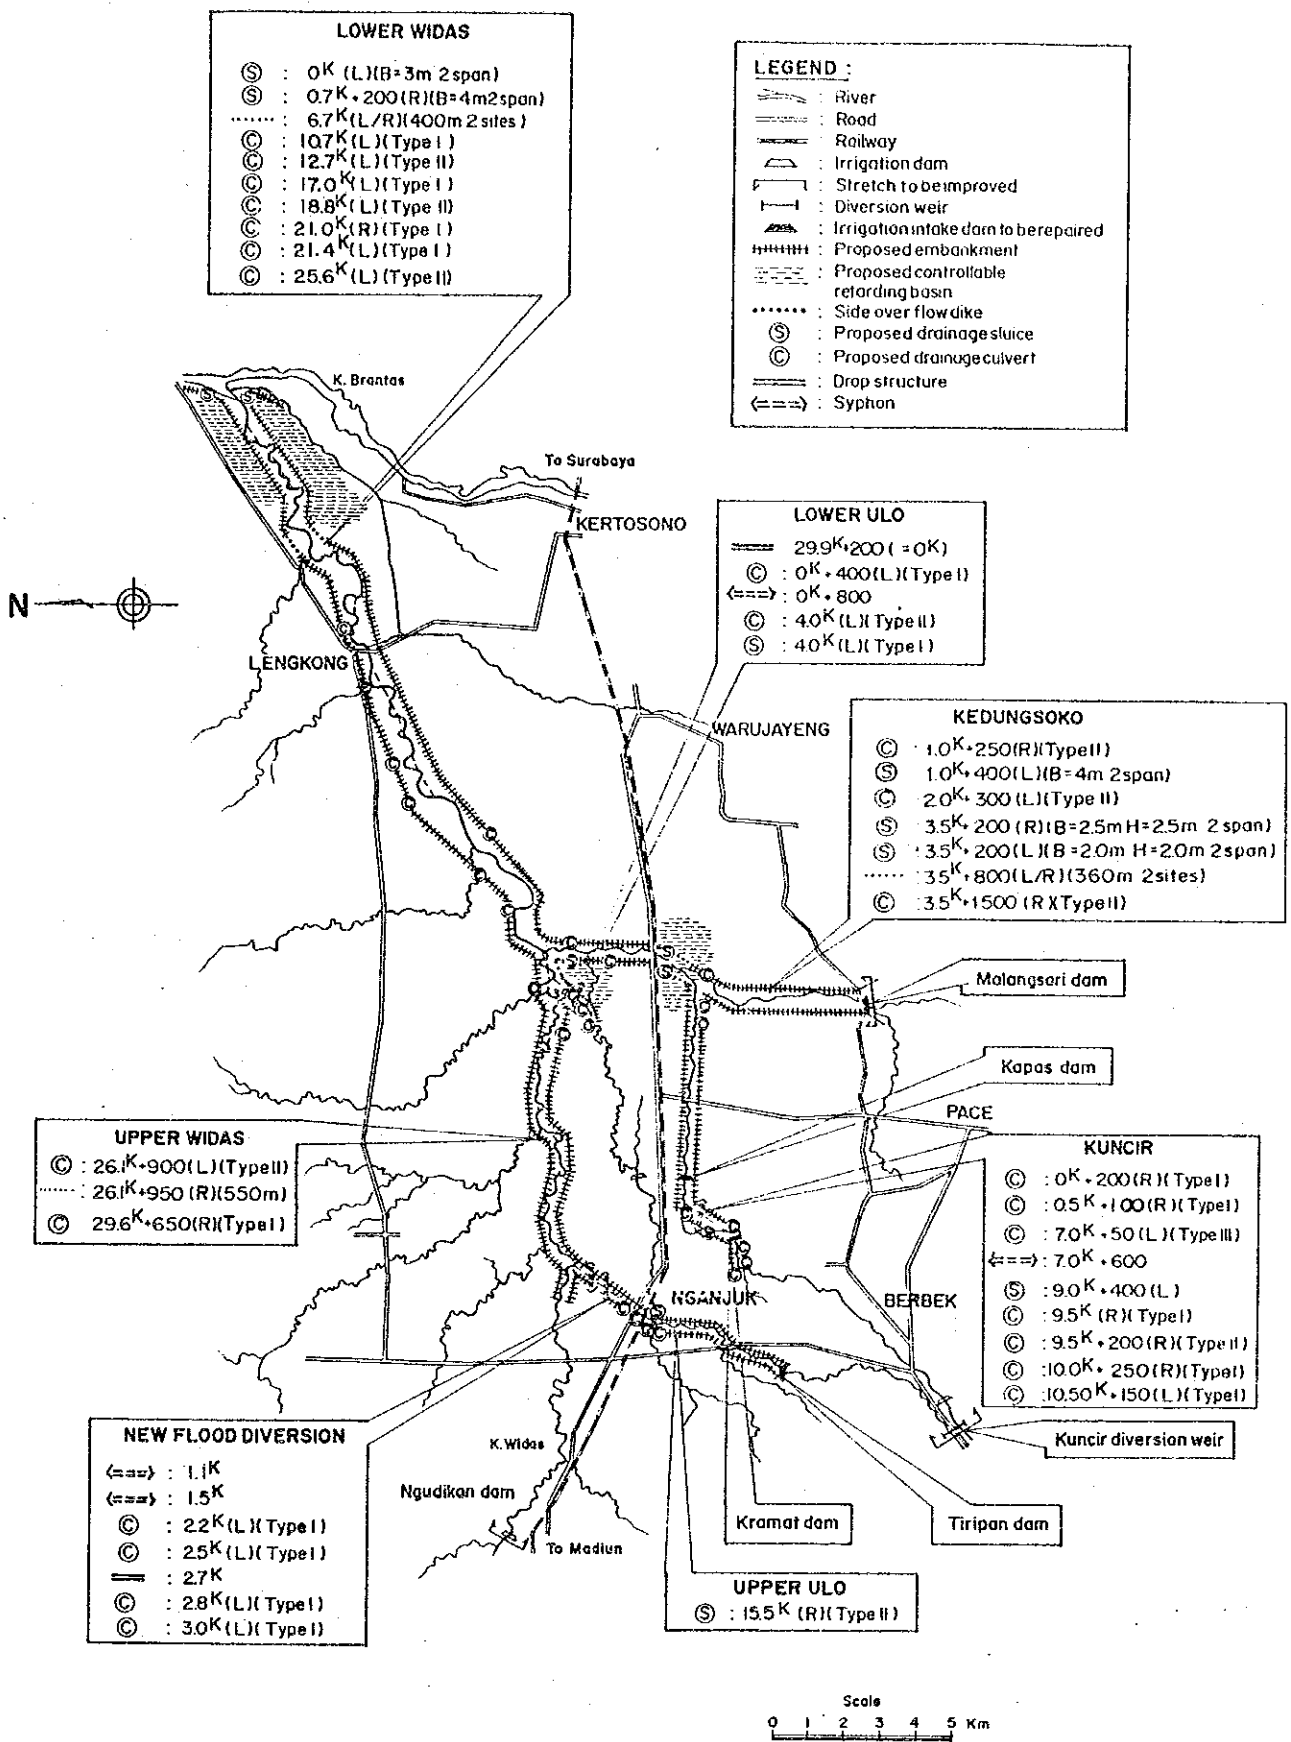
OUTLINE OF PROPOSED STRUCTURES OF COMPREHENSIVE PLAN (2/3)
